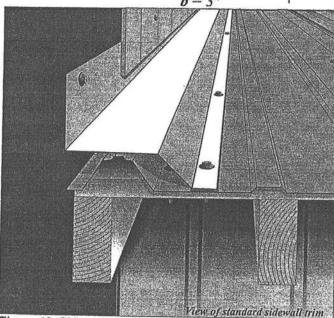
Sidewall flashing is applied when the side of the roof butts up against an adjacent wall. The wall-side of the flashing can either be covered over with siding or sealed with counterflashing. Butyl tape should be applied where the "foot" of the flashing attaches to the roof, and, if used, along the top edge of the counterflashing.
